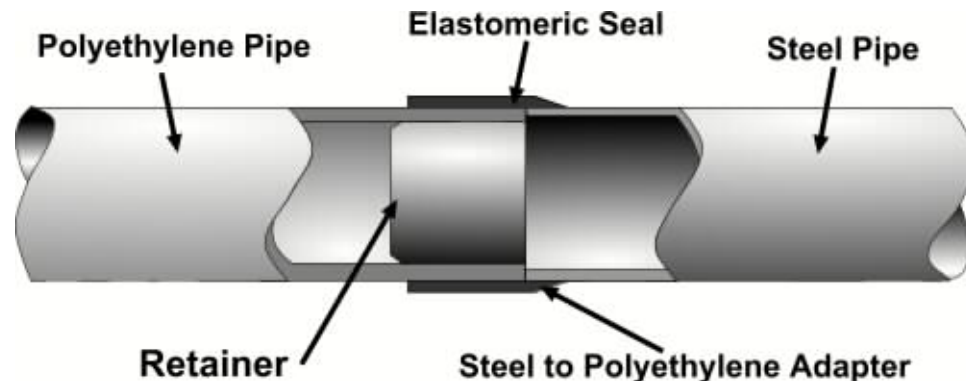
Standard Fitting for Plastic Pipe to Steel Pipe Transition
